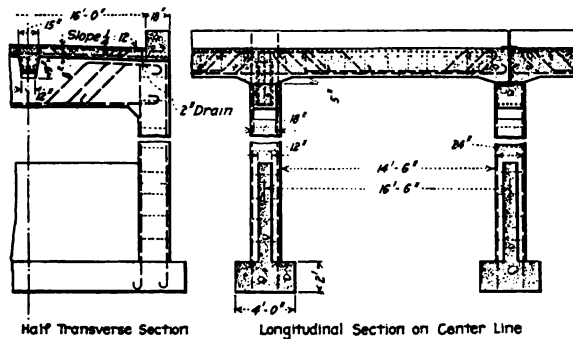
Details of standard trestle spans, Engineering Department, State of Arizona.
